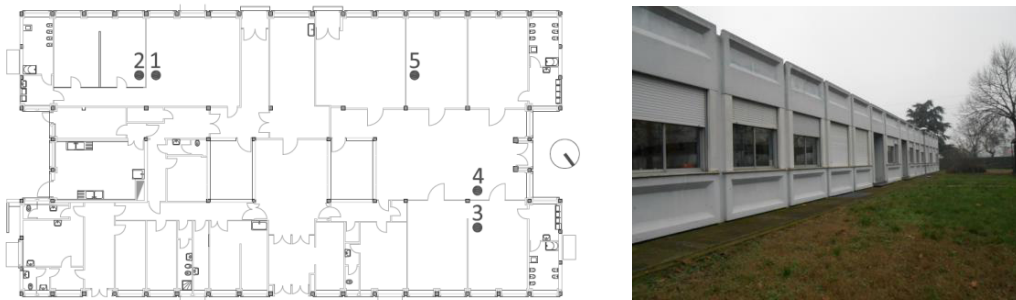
Kindergarten plan view including the five monitored rooms (on the left); picture of the southwest facade (on the right)
